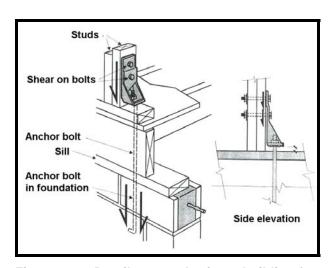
Details on anchoring a building for high velocity flooding and/or high winds.
